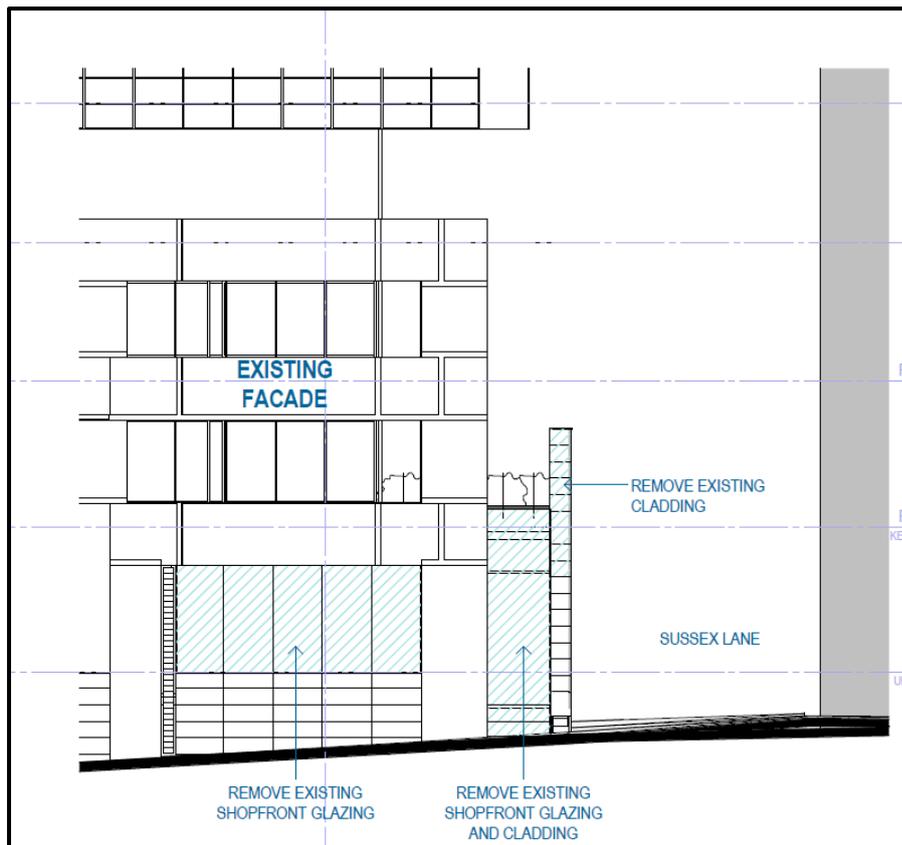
Western elevation at the intersection of Sussex Street and Sussex Lane.
